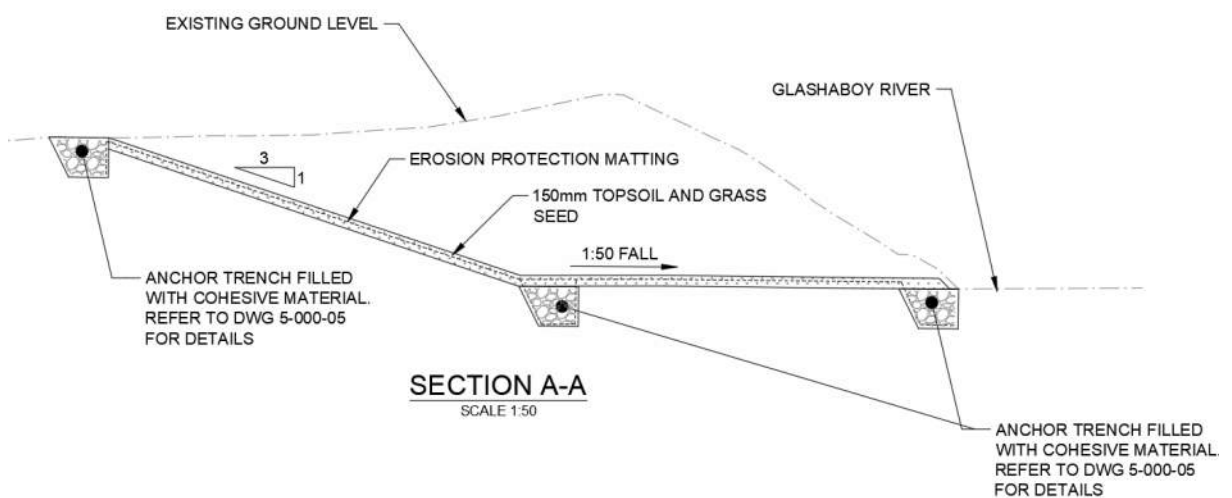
Riverstown Bridge Engineered Side Slopes Cross Section
